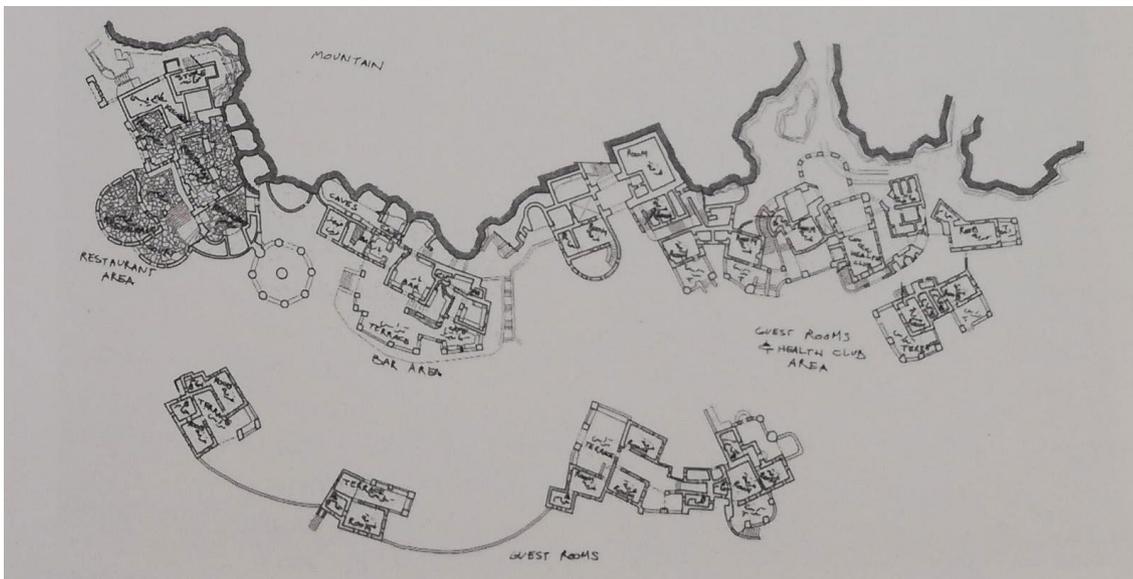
Ground Floor Plan of The Adrère Amellal hotel. Done by Emad Farid
